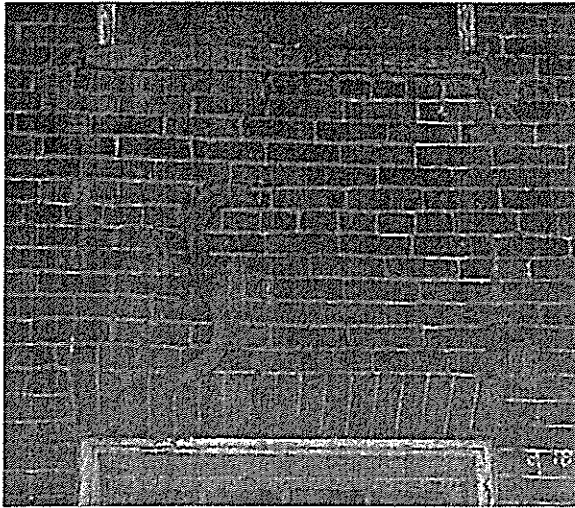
Iron S-plate, East Wall. Two 27" long S-plates at approximately 4" above balcony level anchor portions of the wall to iron ties bars that span the length of the main hall to the heaving west wall. Masonry near these plates is in tension, and as a result, fractures and displacement is evident. The installation date of these plates is unknown, but precedes 1984, when they were noted in a report by Rev. Brown Morton. (Image taken: 11/97)
